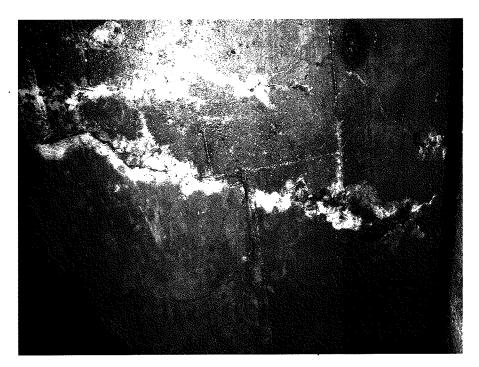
Cracking and Pothole in Approach Pavement near East Reference Line
